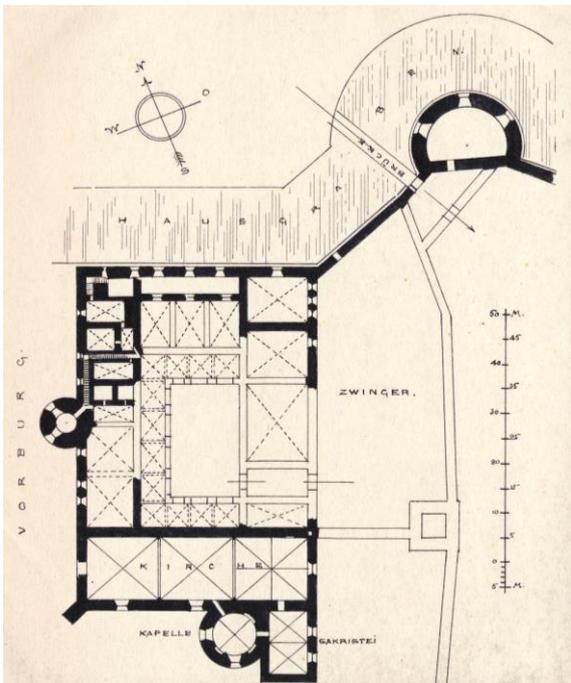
Reconstruction of the Haapsalu Castle plan: 1 – church, 2 – refectory (dining-room), 3 – kitchen, 4 – dormitory (bedroom), 5 – gallery, 6 – residential rooms, 7 – church sacristy, 8 – new sacristy, 9 – tower, 10 – a special room for Christening, 11 – tower for observation. [Academic Library of the University of Latvia, Library of Misins,] [online 19.06.2017, <http://kirikud.muinas.ee/?page=2&subpage=212&id=213&pil t=947>]
